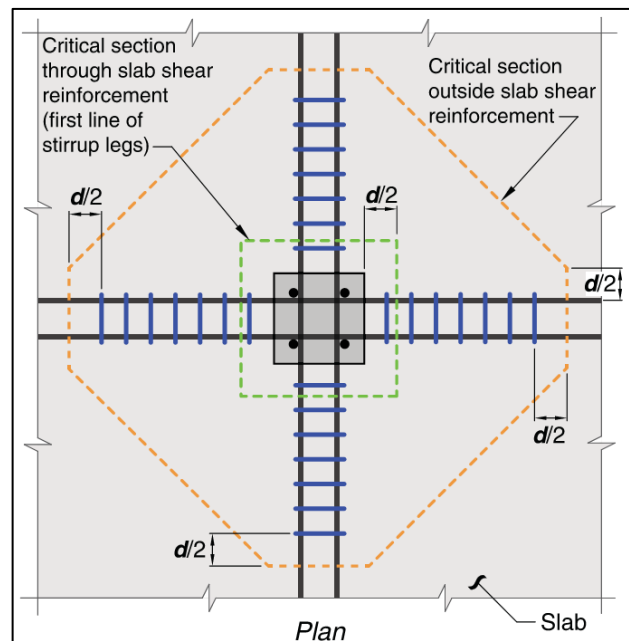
Critical Section Through Slab at Column Location (Figure from ACI 318-19 Section 22.6.4)
